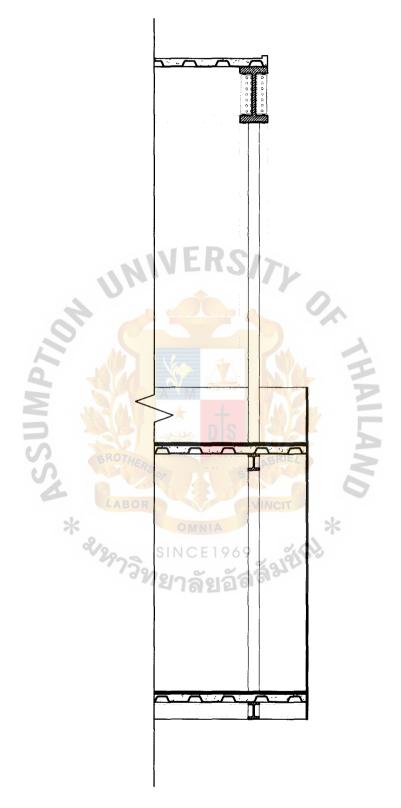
Detail section of steel structure (Image Source: Author's image)
